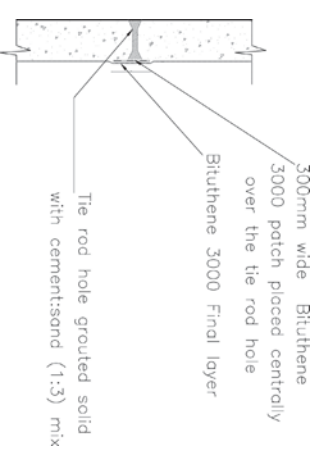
Detail section showing sealing of tie rod holes
